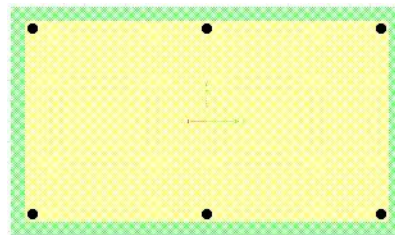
C035X060X06Q16XQ08/15X02X02 Section
